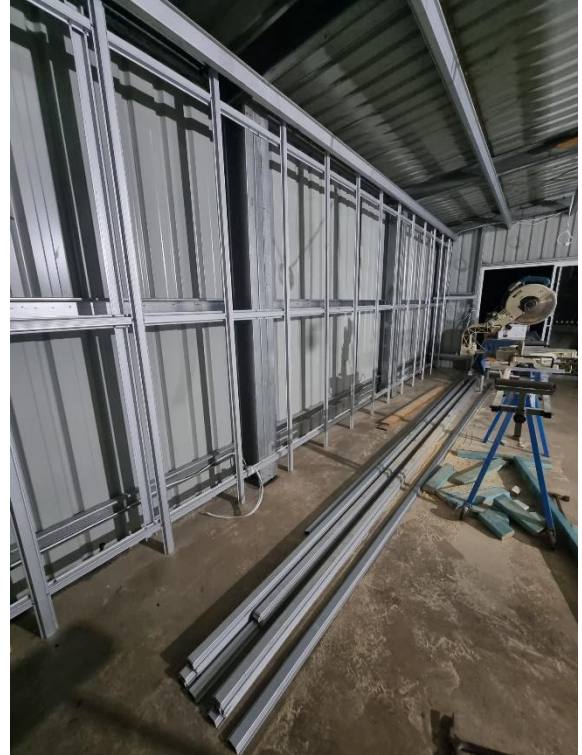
Top hat frame installed to support internal wall lining (client supplied)
